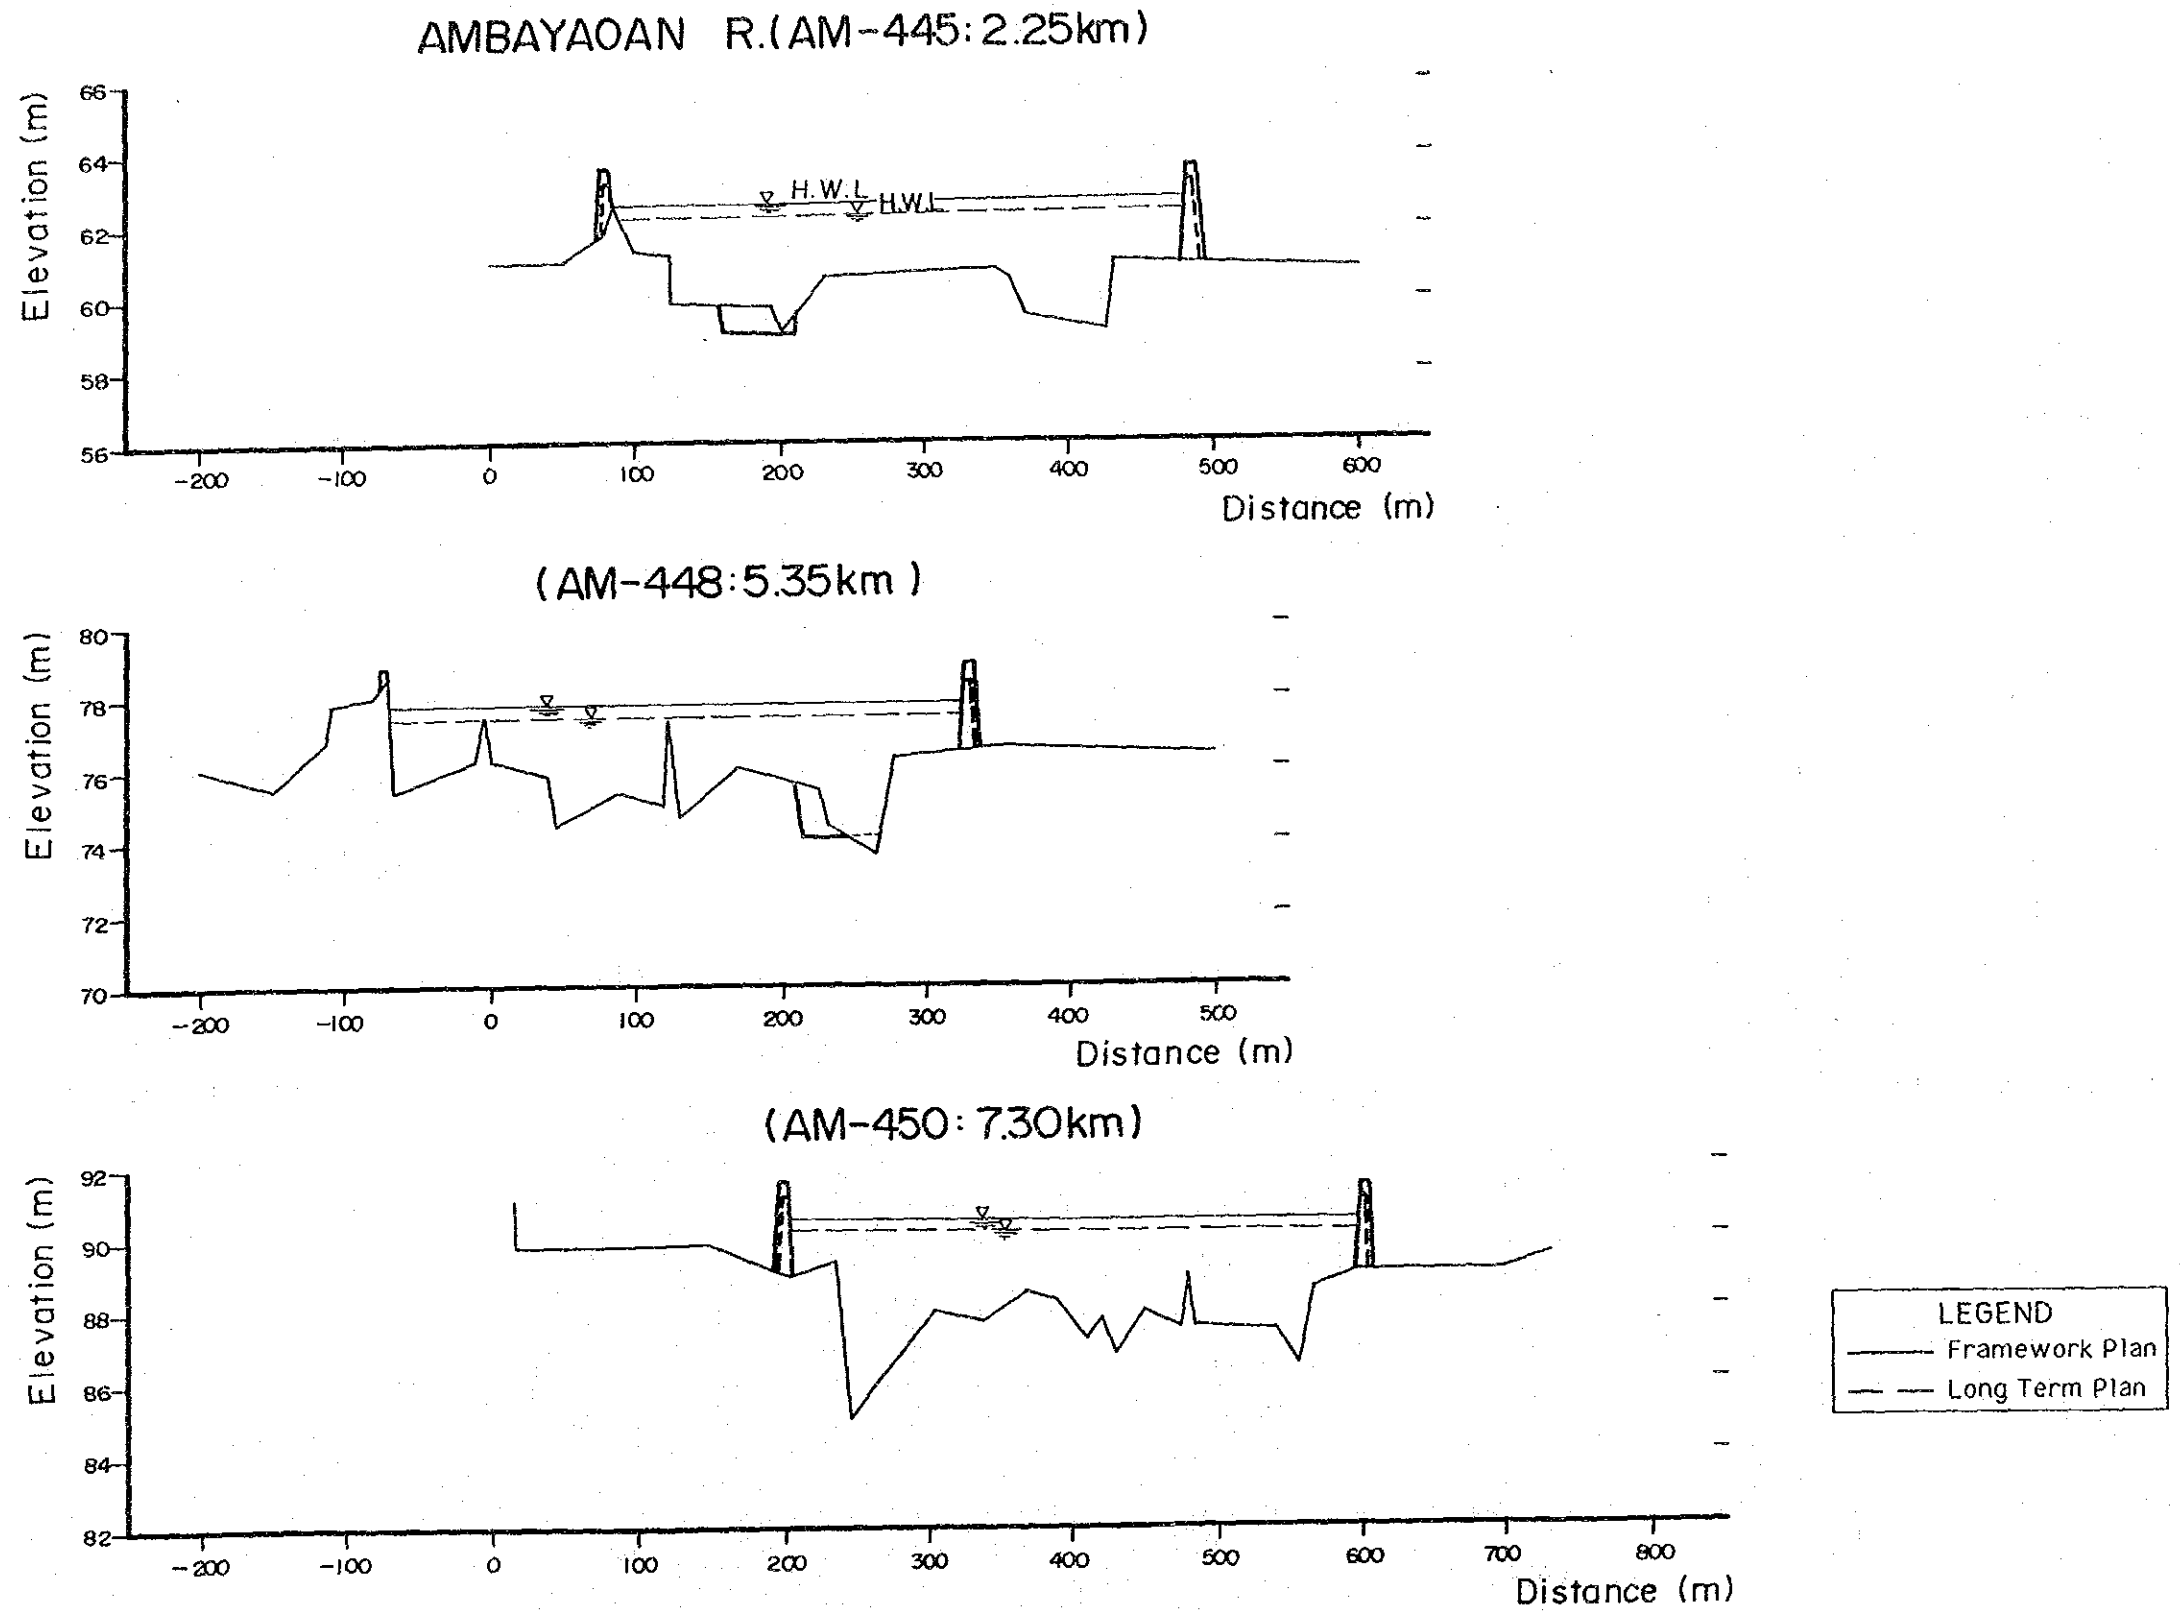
TYPICAL CROSS-SECTION OF AMBAYOAN RIVER
